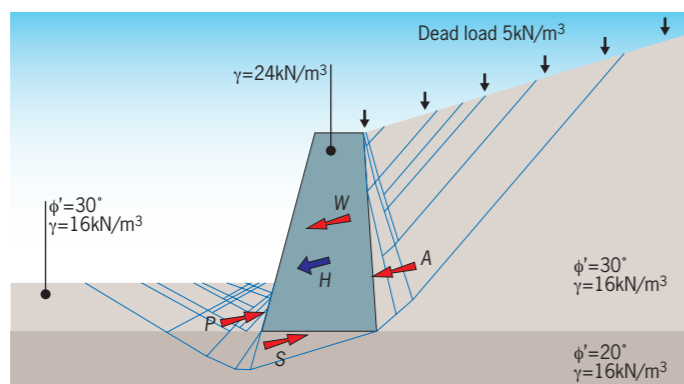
Design check against combined sliding and bearing capacity failure of a 4m high gravity retaining wall (translational mode).
